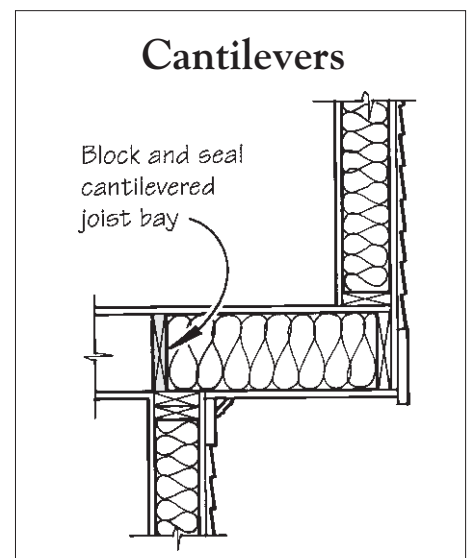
Cantilevers can cause convective heat loss unless an air block is added in the joist bay above the first-story top plate.
